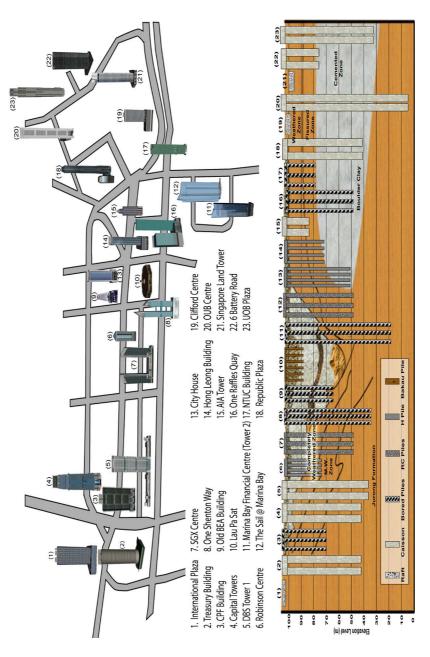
Foundation system of some major buildings in the Central Business District (CBD).
